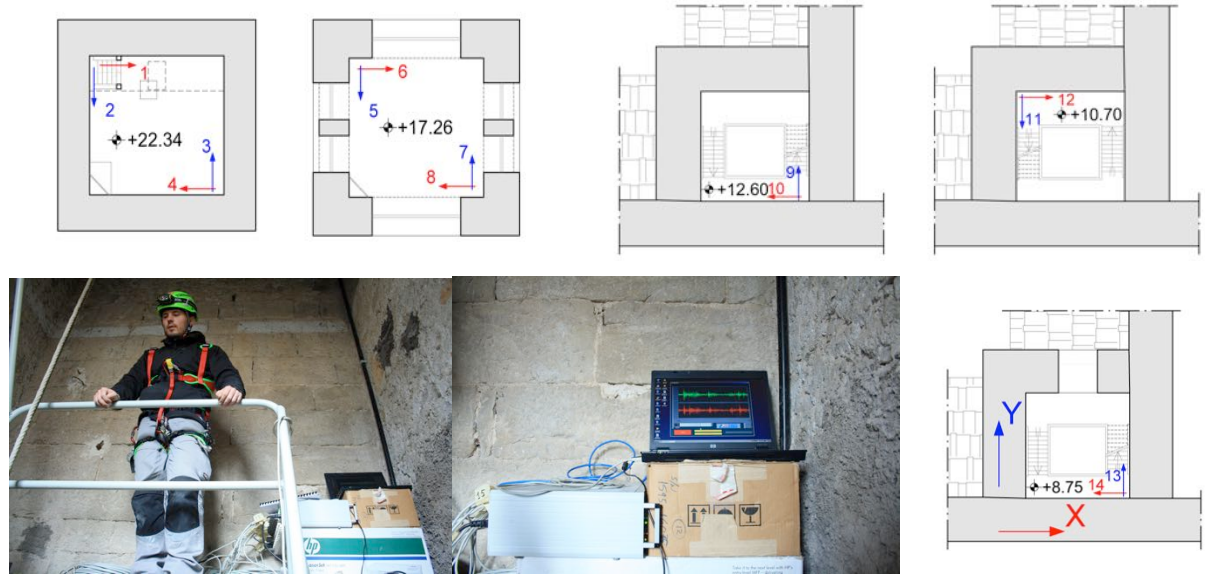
Dynamic testing of the Saint Bartolomeo's church bell tower: sensor layout (from top to bottom instrumented sections, clockwise) and data acquisition system.
